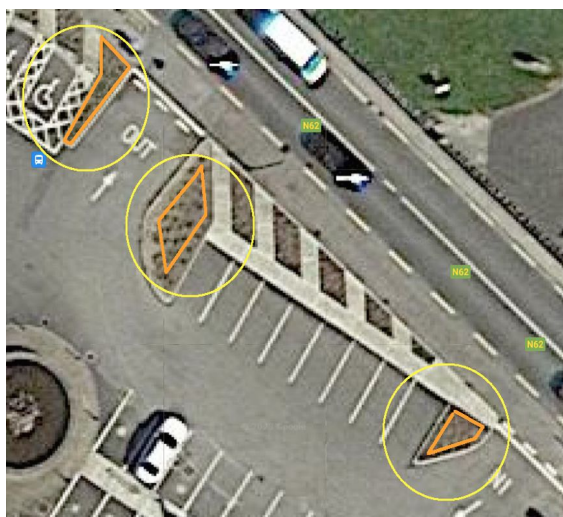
Plan view of discussion sketches for rain-gardens in community hall car park.
